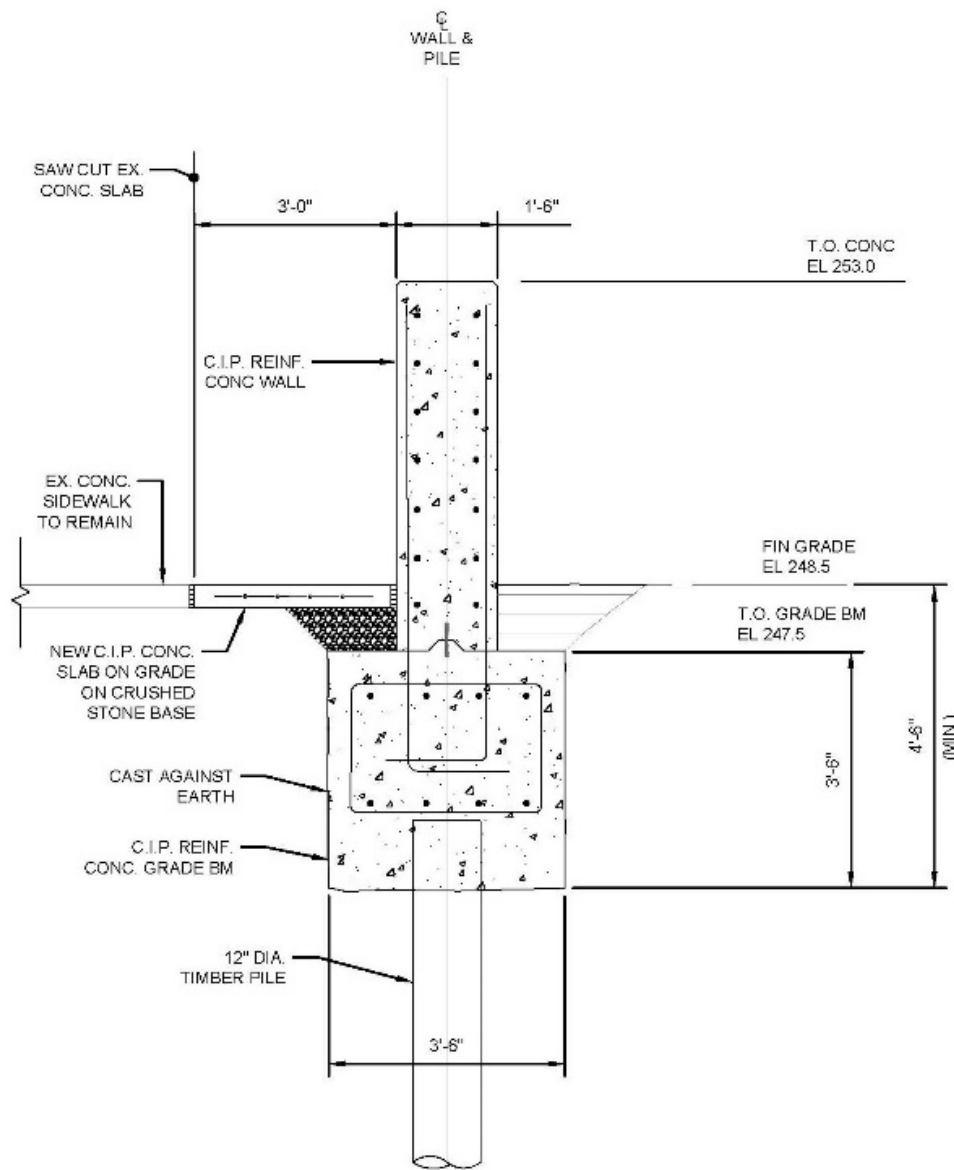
Monroe County Sheriff Marine Headquarters Flood Wall Typical Detail
